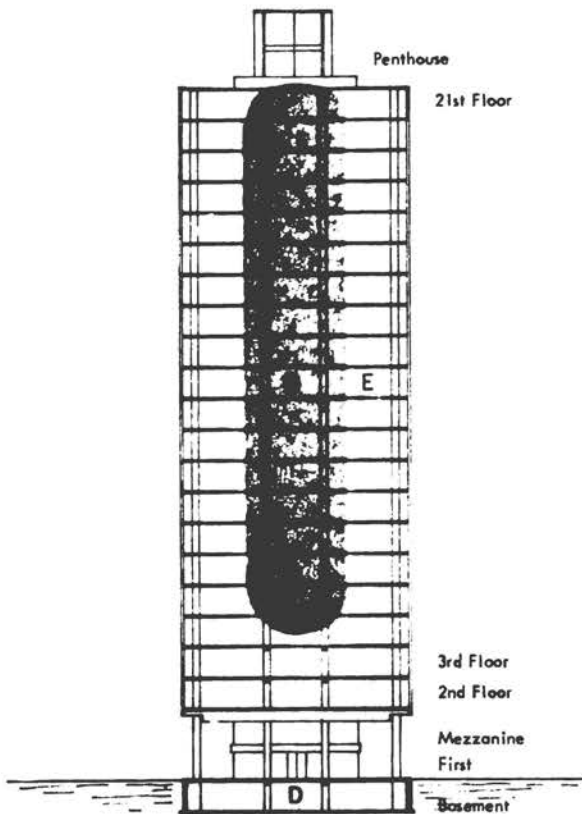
22-Story apartment building. Area D has protection factor of 10-50; Area E has 2-10.
